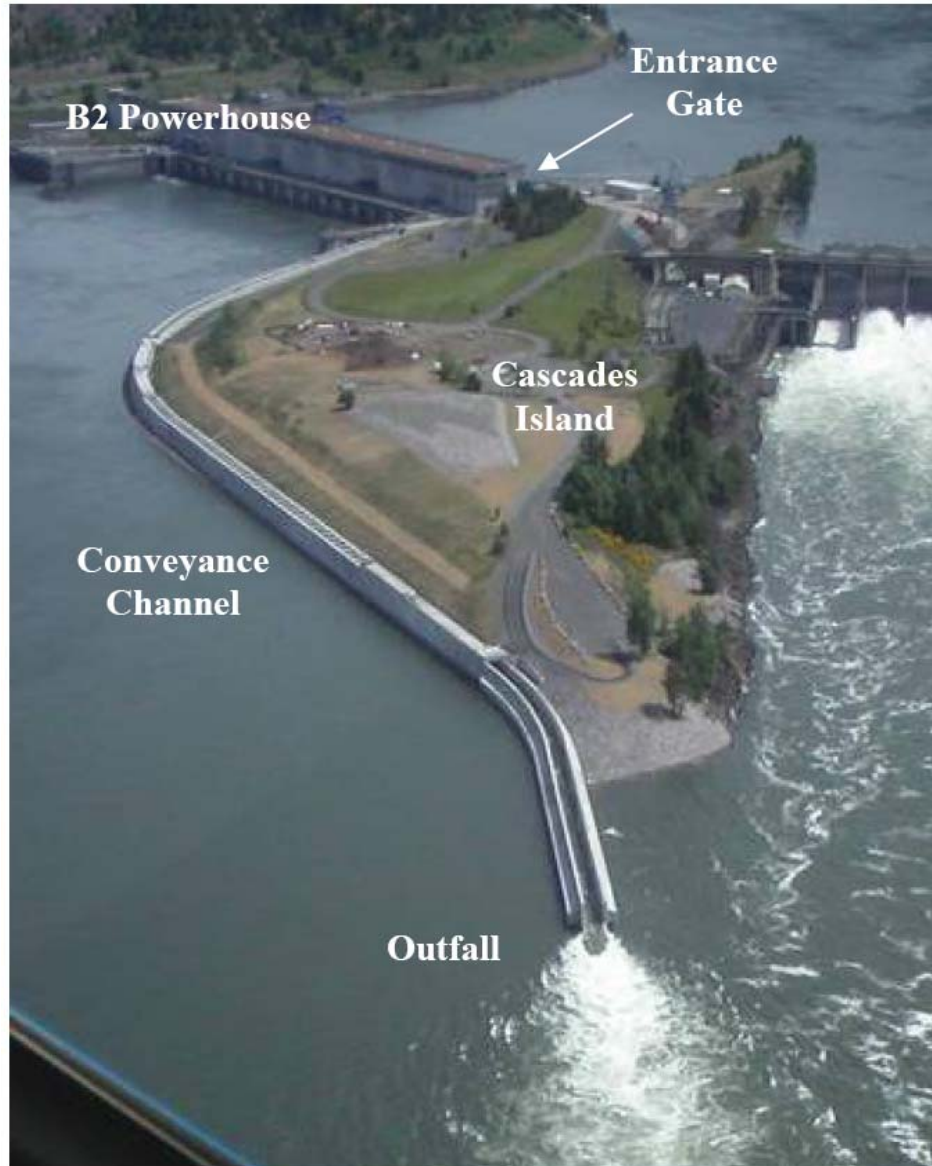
B2 SFO layout: corner collector entrance, conveyance channel, and outfall
